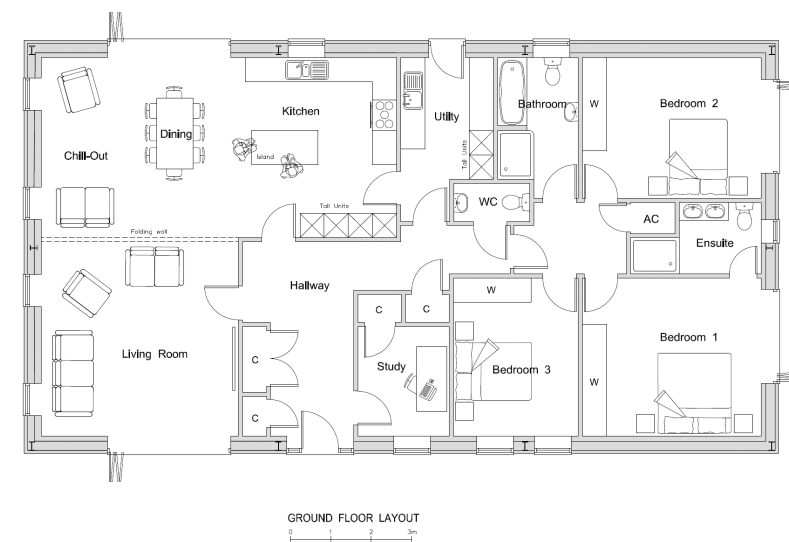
extract of Proposed Floor Plan (K1712-04a)
